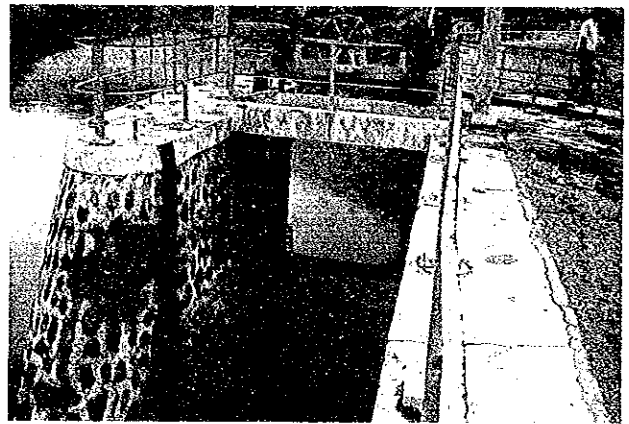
Cracks of Parapet Wall near Intake Tower for Irrigation
